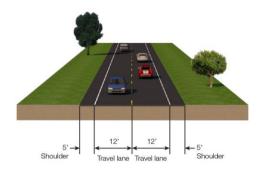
Typical Two-Lane Undivided Roadway Section for Parallel Corridors
